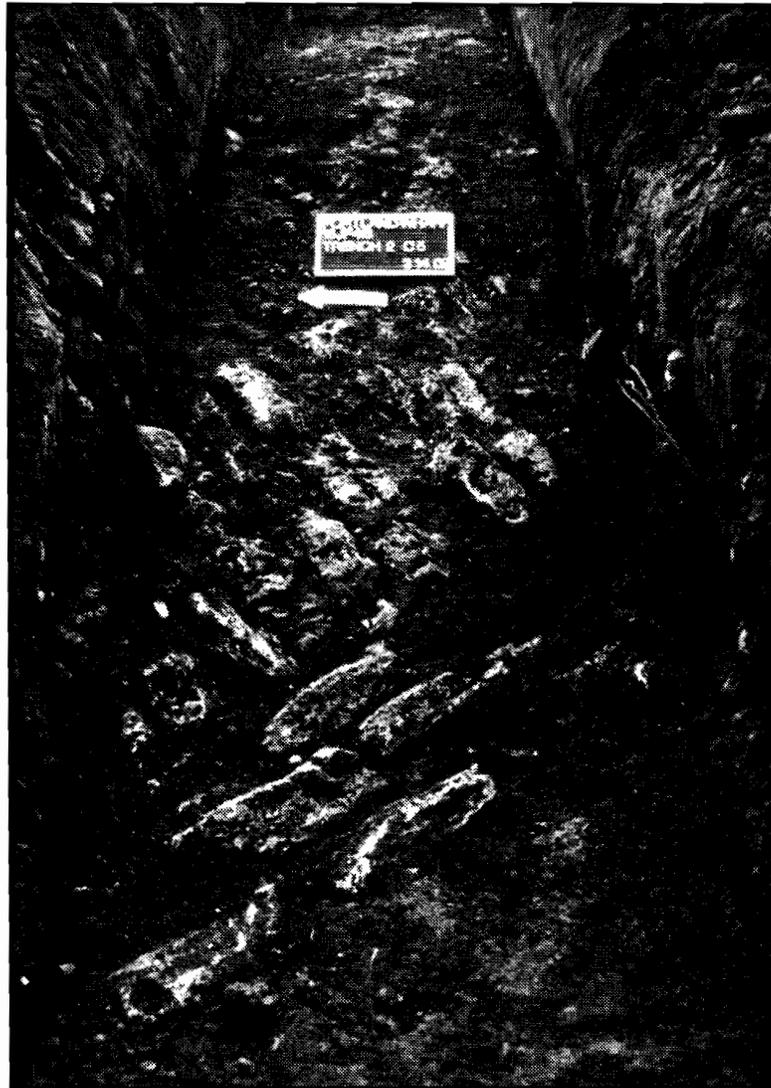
A SECTION OF BOWLDER PAVEMENT FROM FLORIDA STREET.
